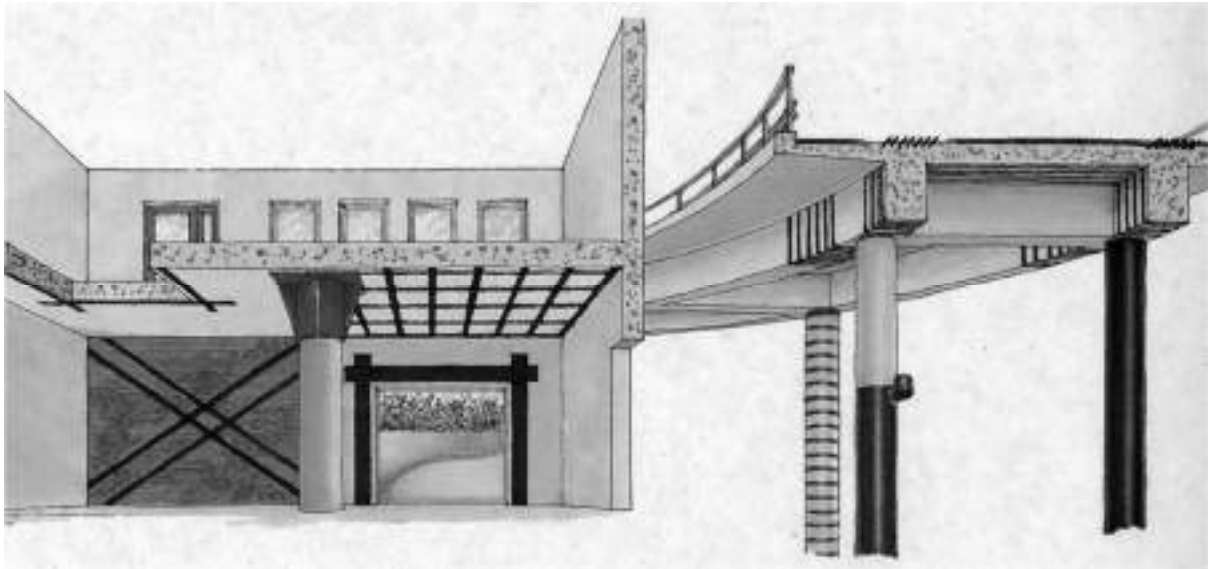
10 Examples of FRP strengthening of concrete structures [24].
